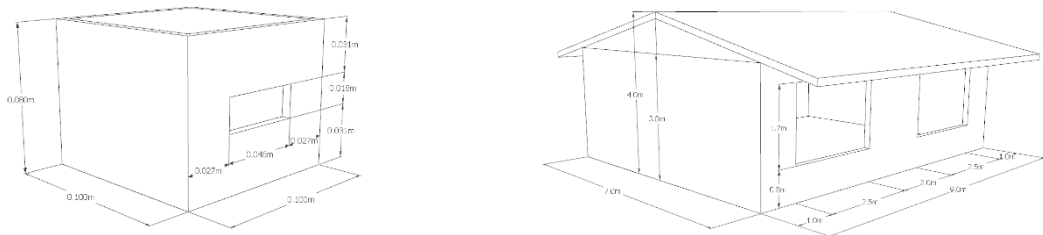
Building geometry description with on the left the cubic building and on the right the school building
